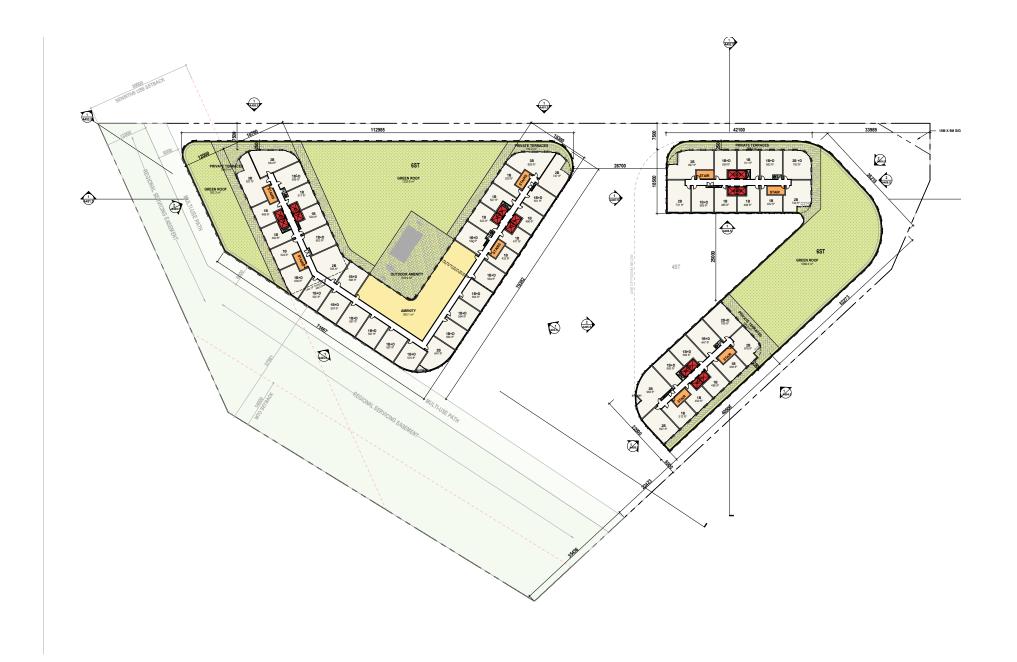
Level 7 Floor Plan (BDP. QUADRANGLE ARCHITECTS LTD.)
